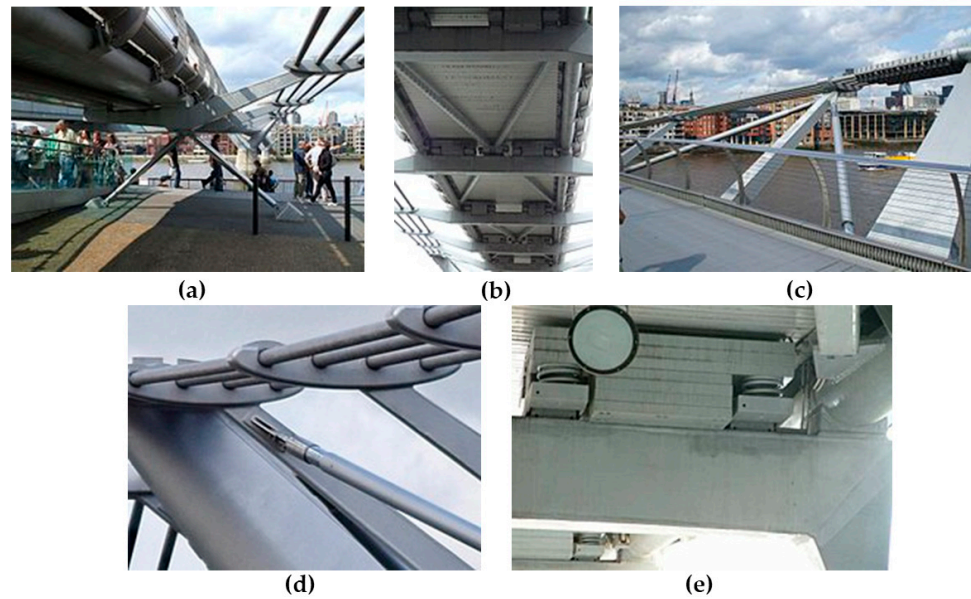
The several kinds of dampers set on the Millenium Bridge after the 2001–2002 retrofit: (a) vertical-to-ground dampers; (b) chevron dampers; (c) pier dampers; (d) moving end of pier dampers; (e) TMDs.
